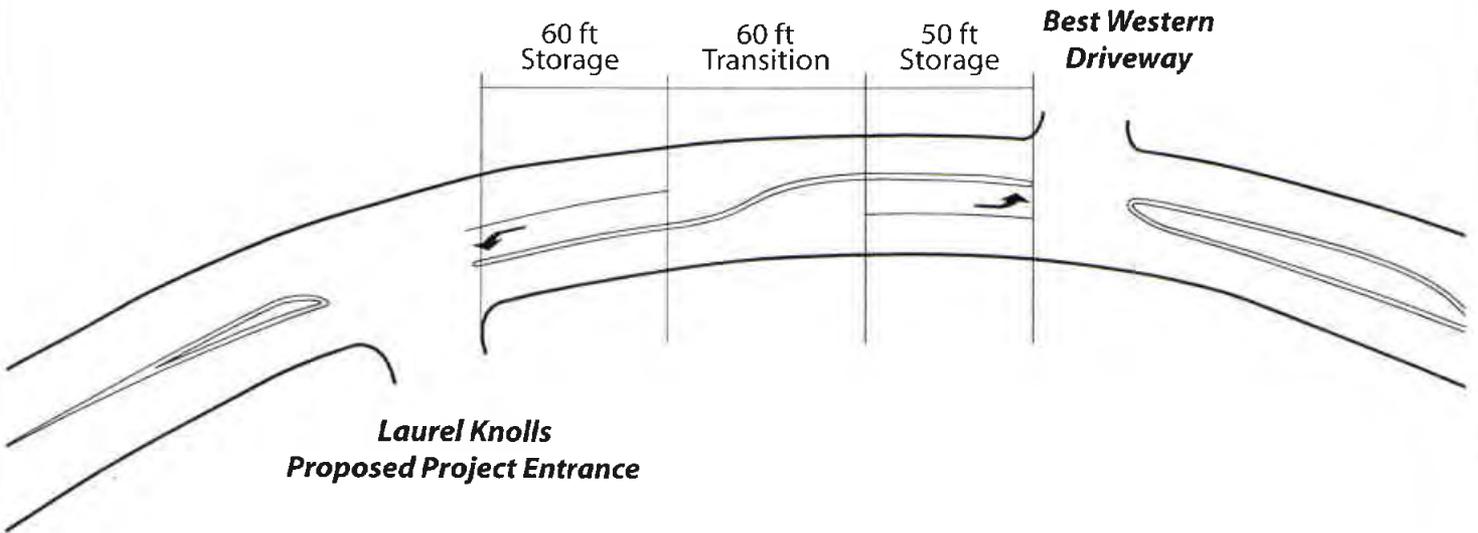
| PROPOSED CHANGES TO PAVEMENT MARKINGS
